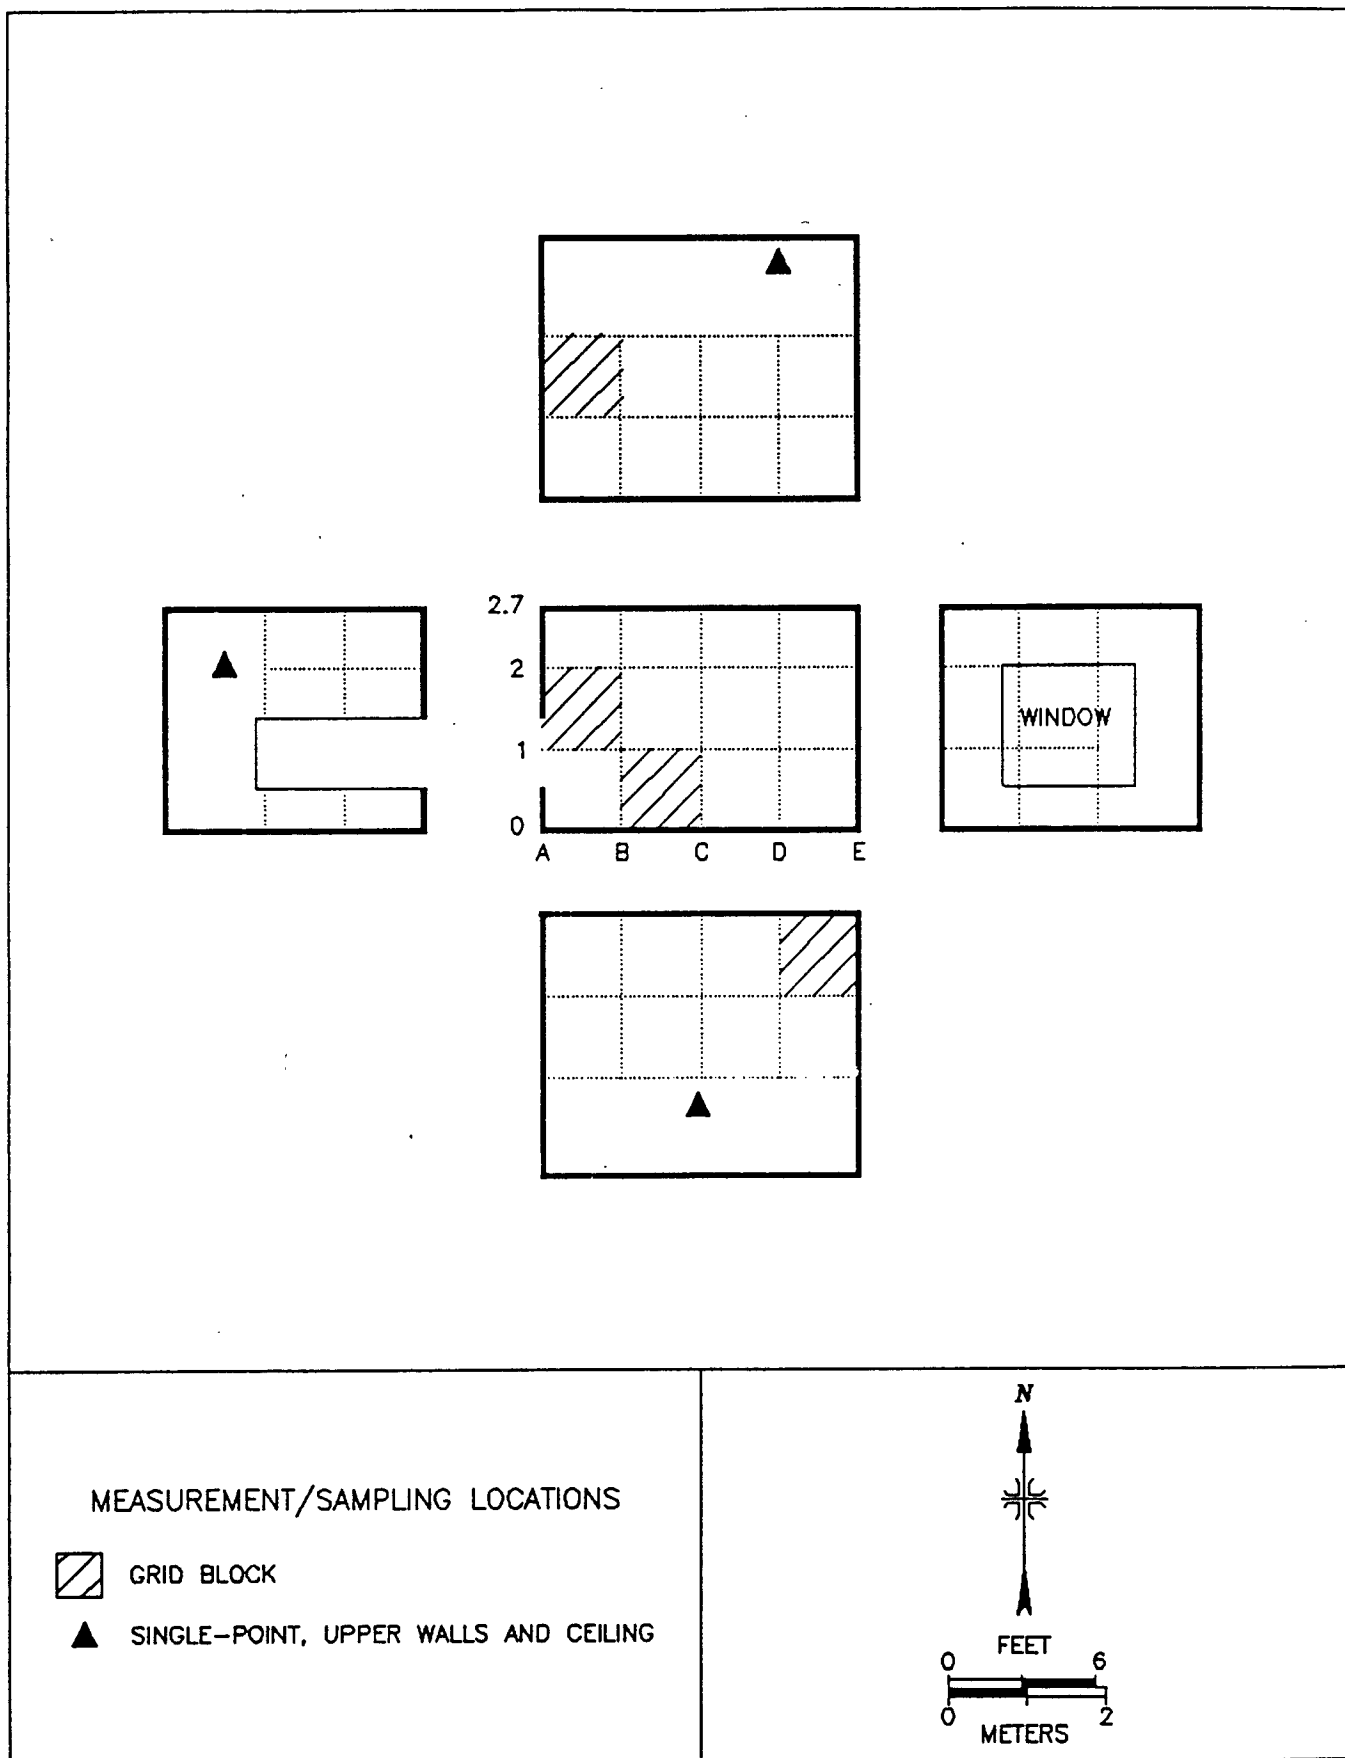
Building 401A, Room 13 - Measurement and Sampling Locations
